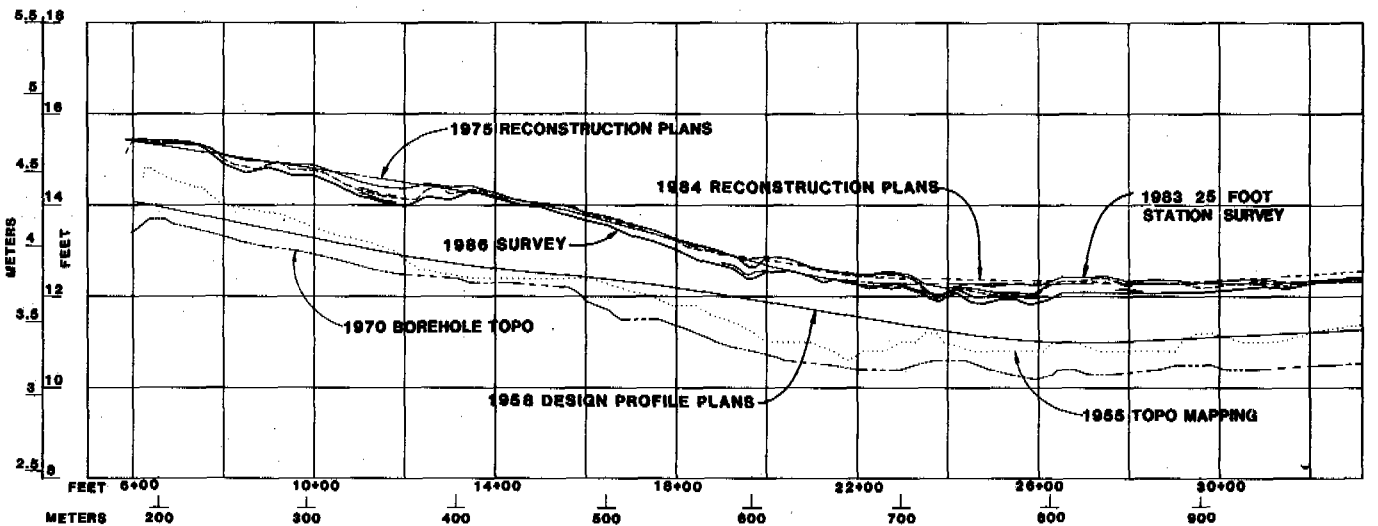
Pavement Surface Surveys - A Portion of East-West Runway Centerline
